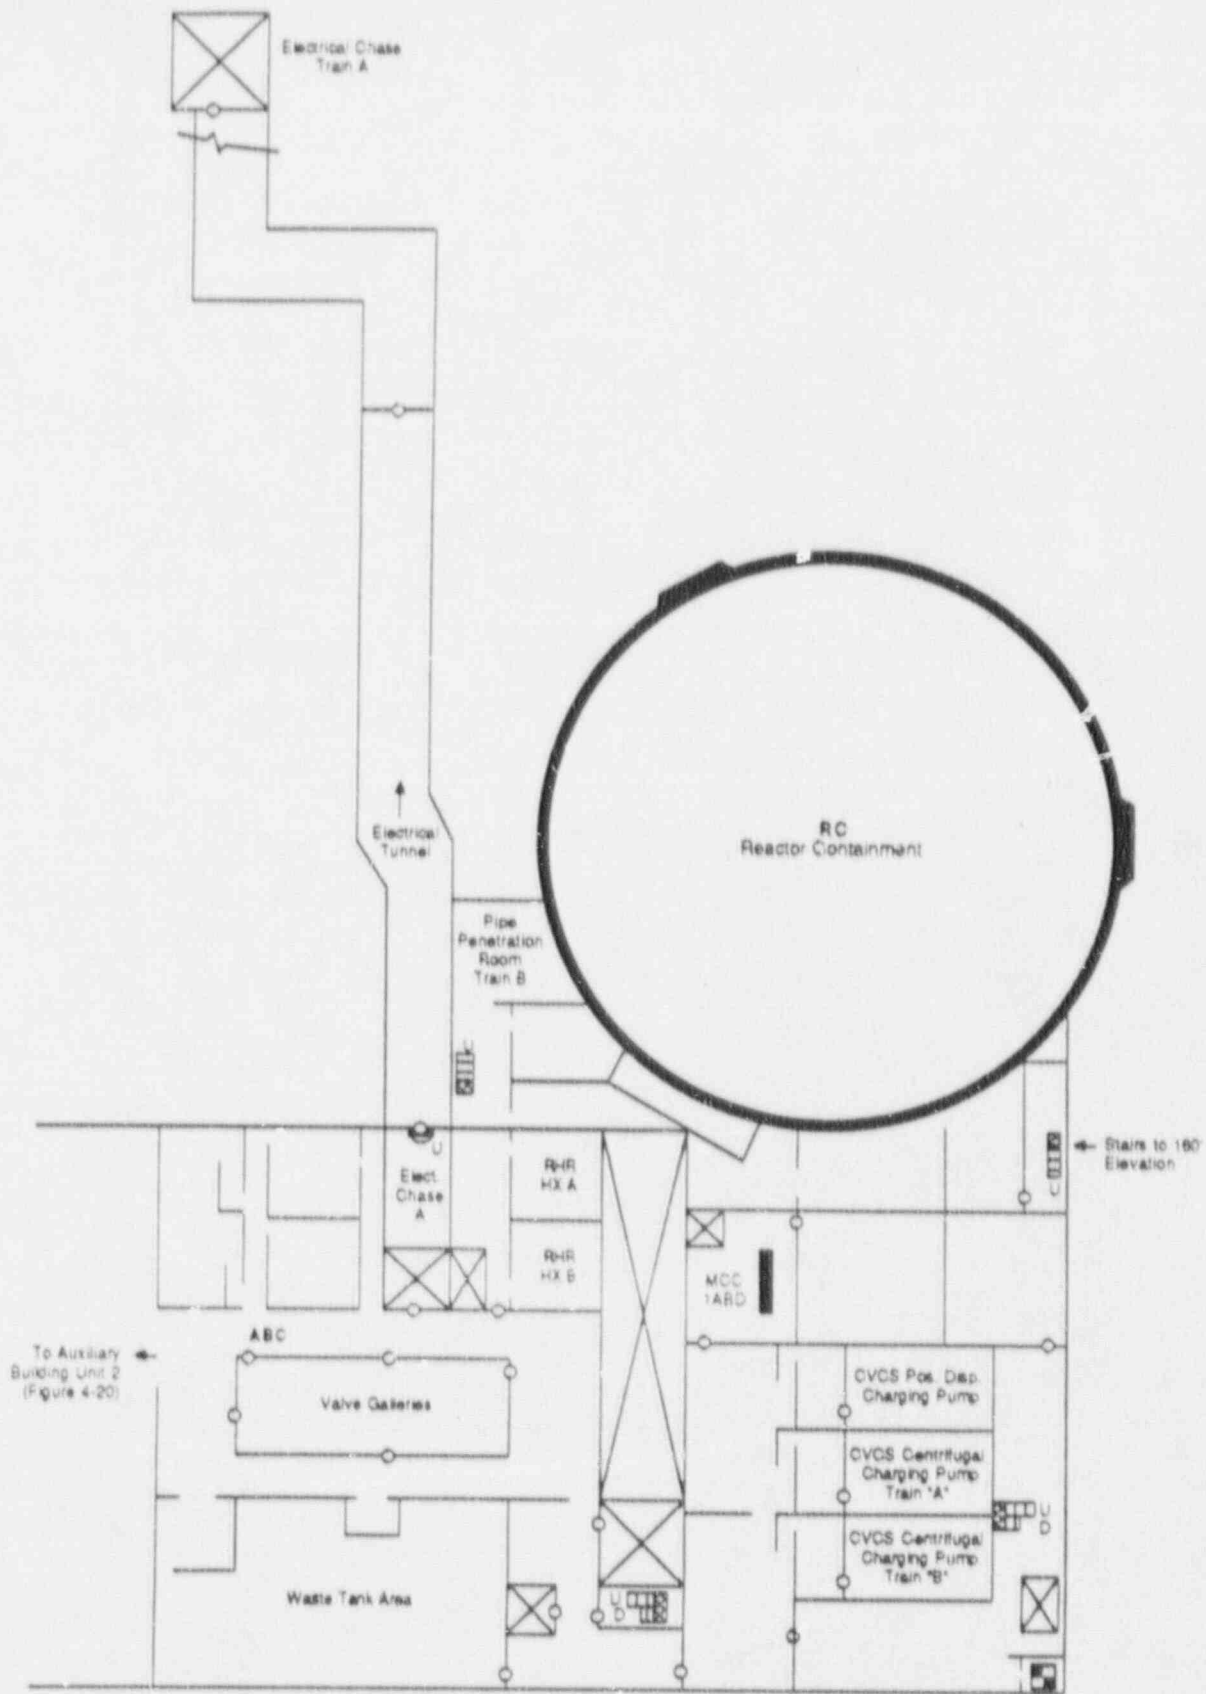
Vogtle 1 Auxilliary Building, Level C (Elevation 143'-6" to 170'-6")
